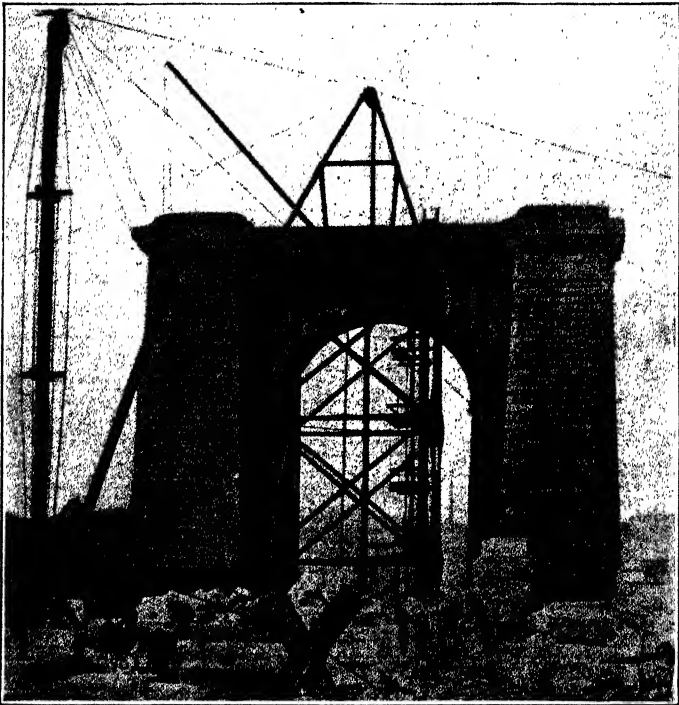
Masonry Pier of Blackwell's Island Bridge, New York.
